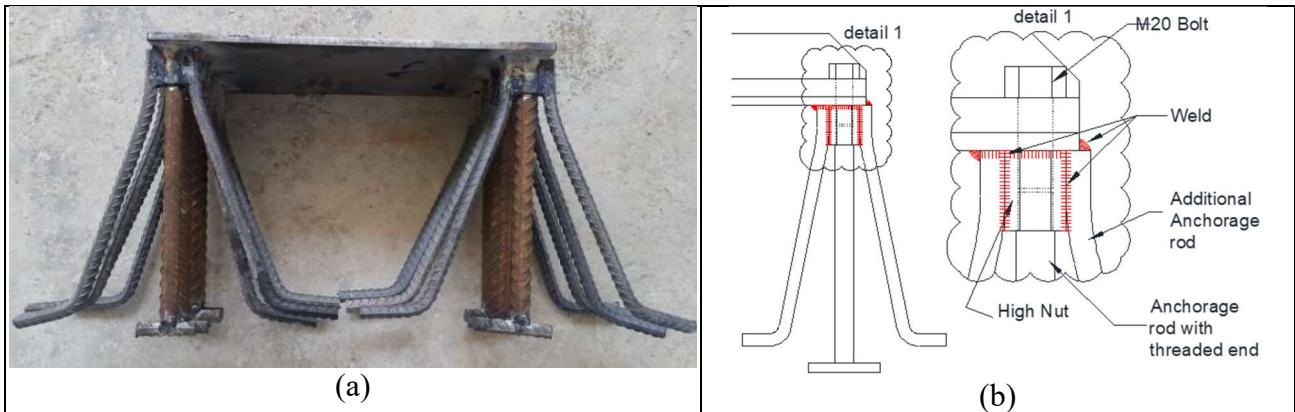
Anchorage details of the column surface plate used for CB2-Pre-1 and CB2-Pre-2 specimens; (a) Details of column surface plate; (b) Details of anchorage, bolt and fastening
